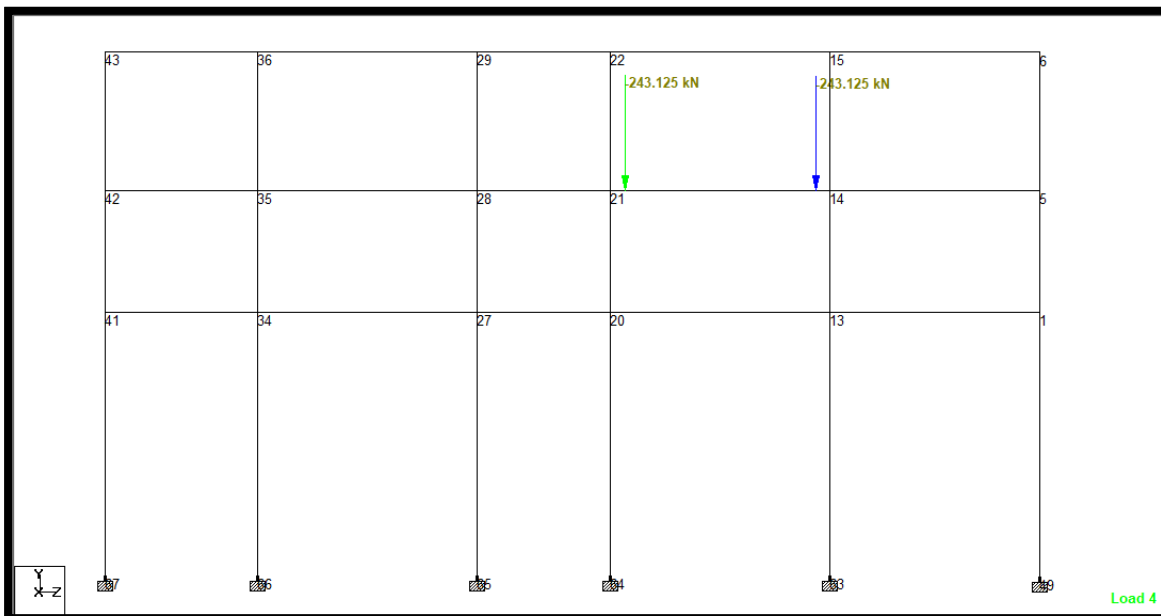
10 Crane wheel load on beam (Crane load-1)
